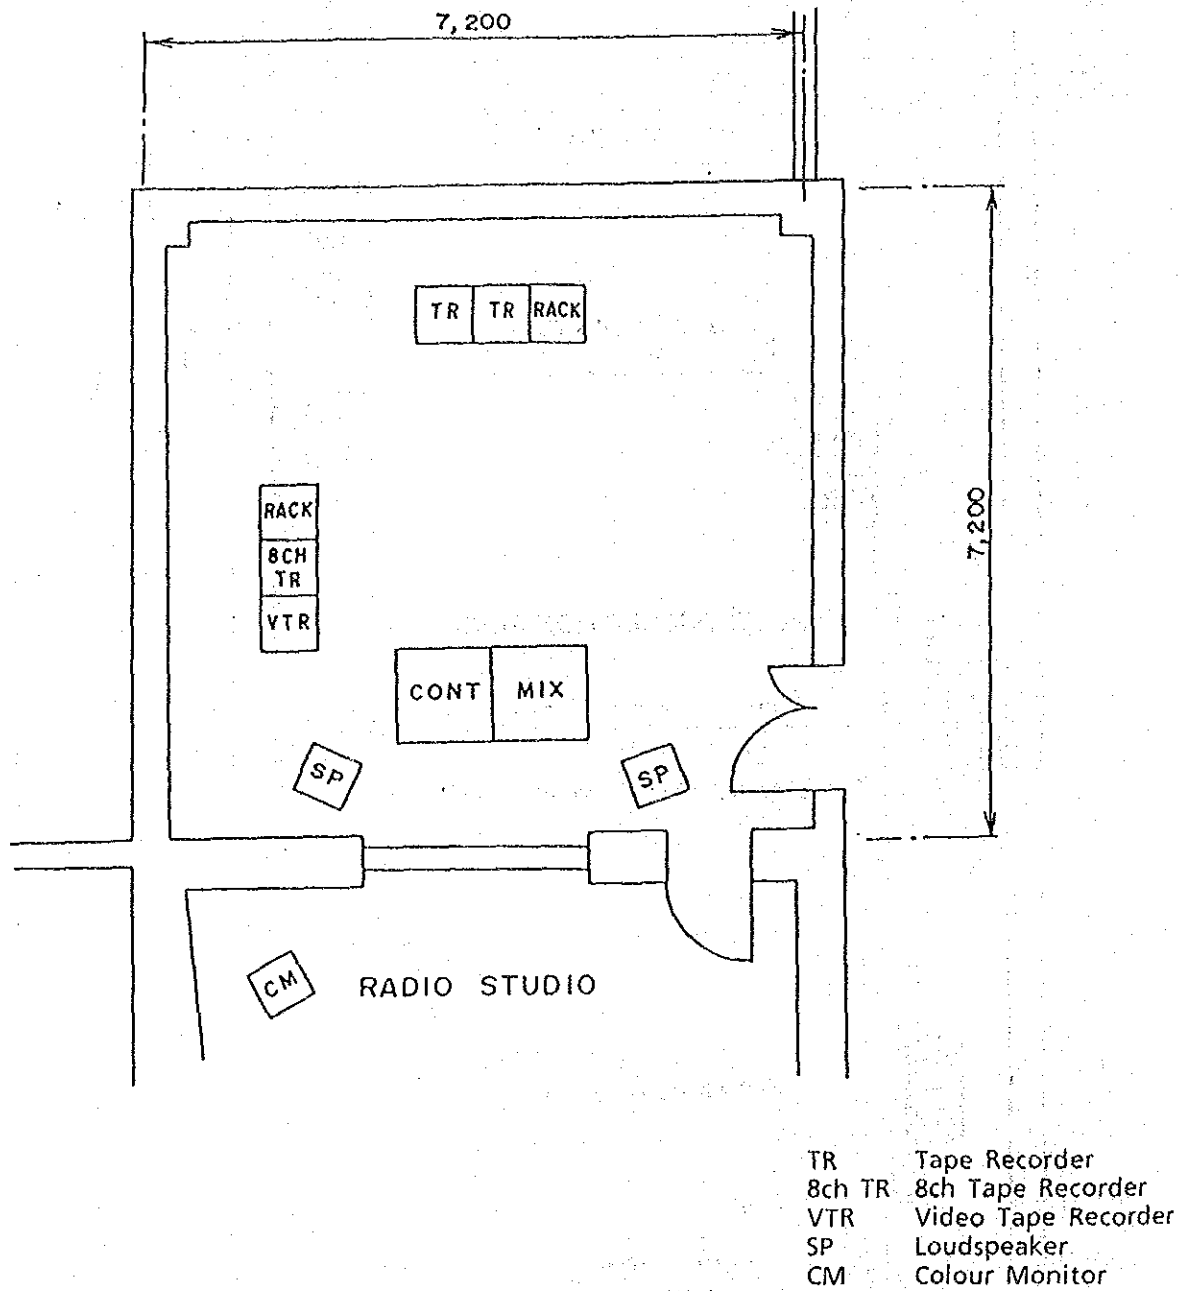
' Layout of Radio Studio Sub-Control Room
